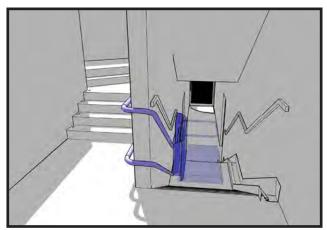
Proposed application. Steps to raised ground floor and inclined platform lift to basement and all upper floors.
